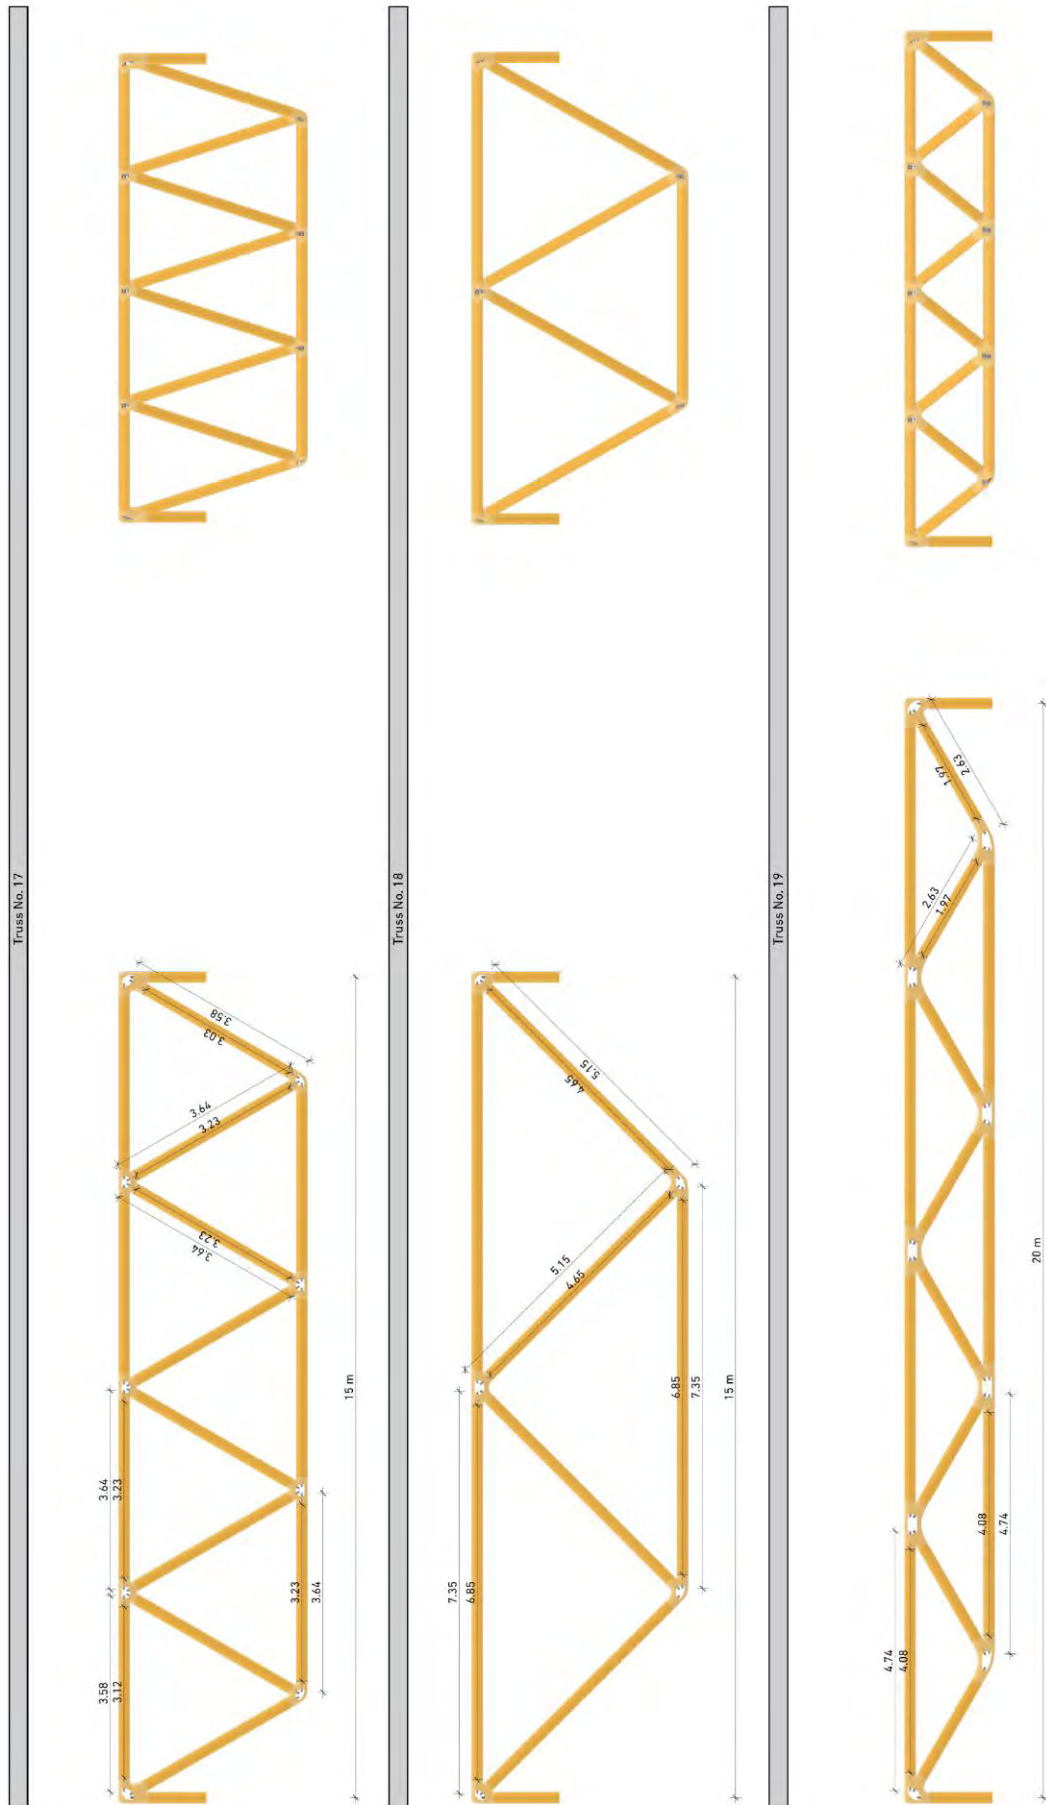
Truss types 17 - 19 (strut member lengths and perspective)
